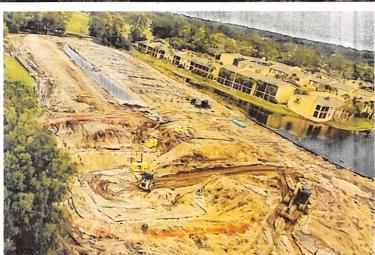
More stormwater measures for Meadow Walk. Addresses situation with Zone 2.
